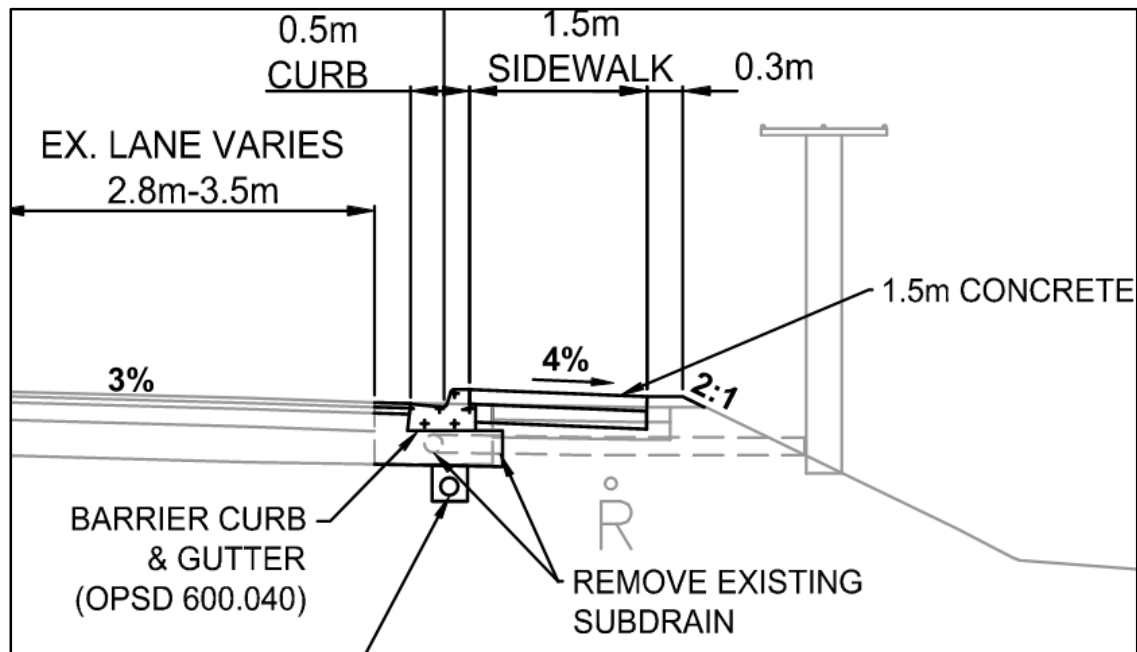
2025 Drainage Design Solution, Southern Portion of Station Road (east side looking north)
